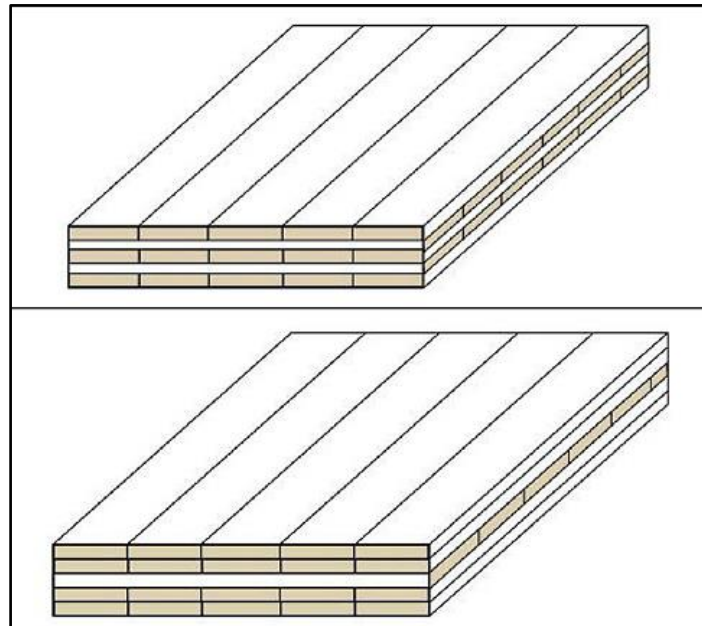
Lay-up of CLT. Upper – homogenous lay-up, bottom – five-layered symmetrical layer with double outer layers. (Brander, 2013)
